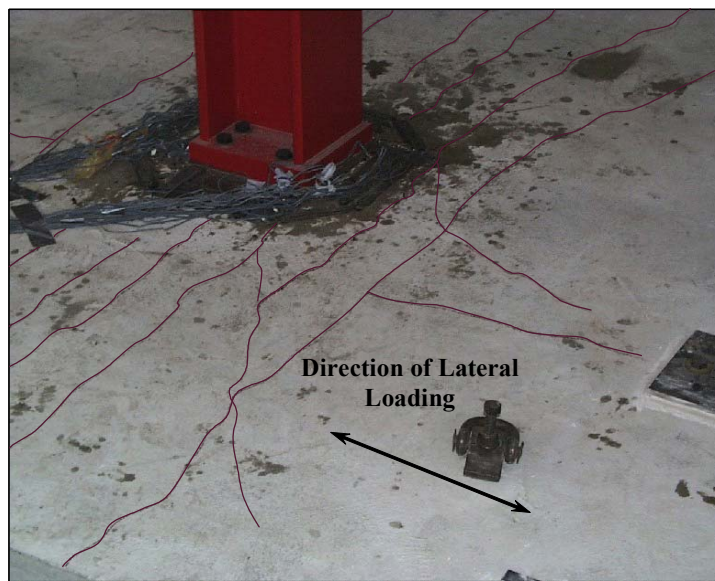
Gravity Load Cracking of Upgrade Specimen A4-S
